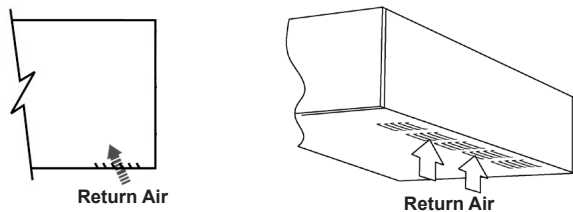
Arrangement 26 Return Air Bottom Grille/Outdoor Air Top Duct Collar
